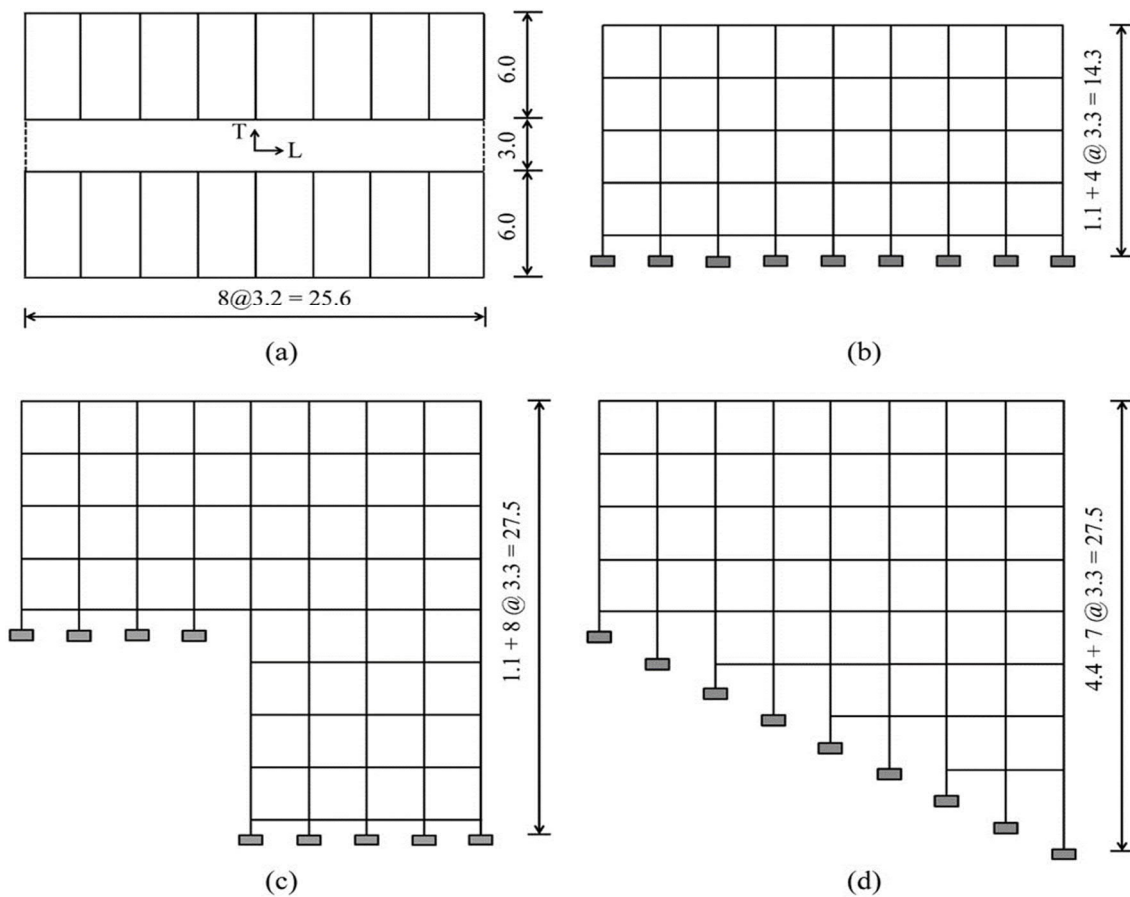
(a) plan and elevation of a four-storey model, (b) flat land (FL), (c) split-foundation (SF), and (d) step-back (SB)
